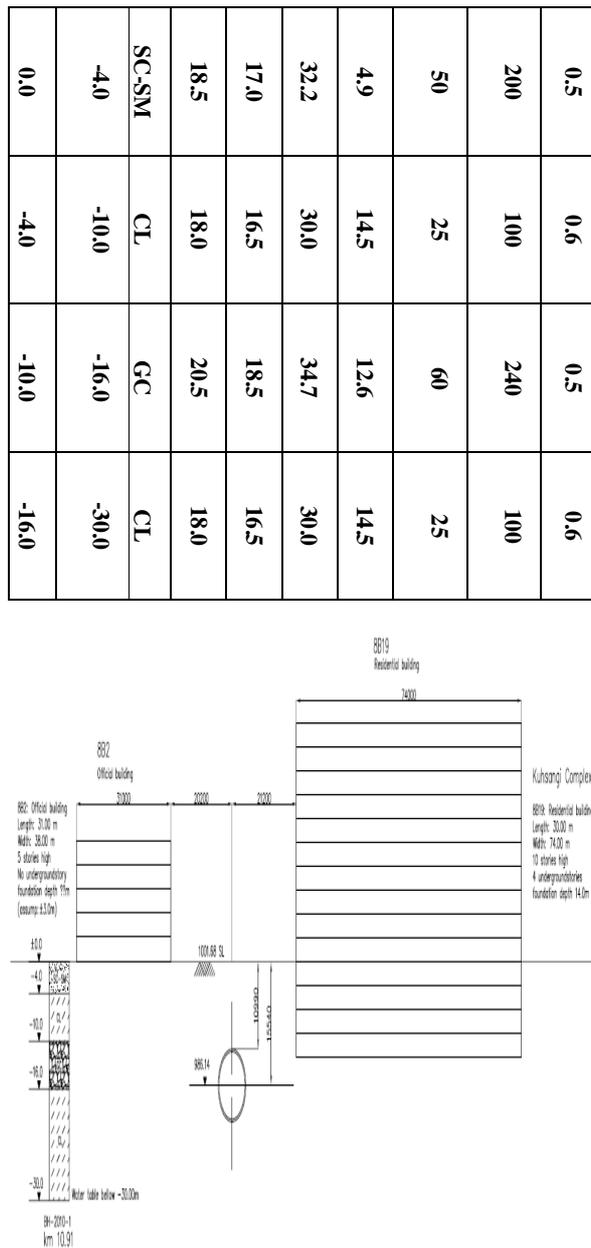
Schematic cross section of building 8B19, tunnel and geotechnic borehole
